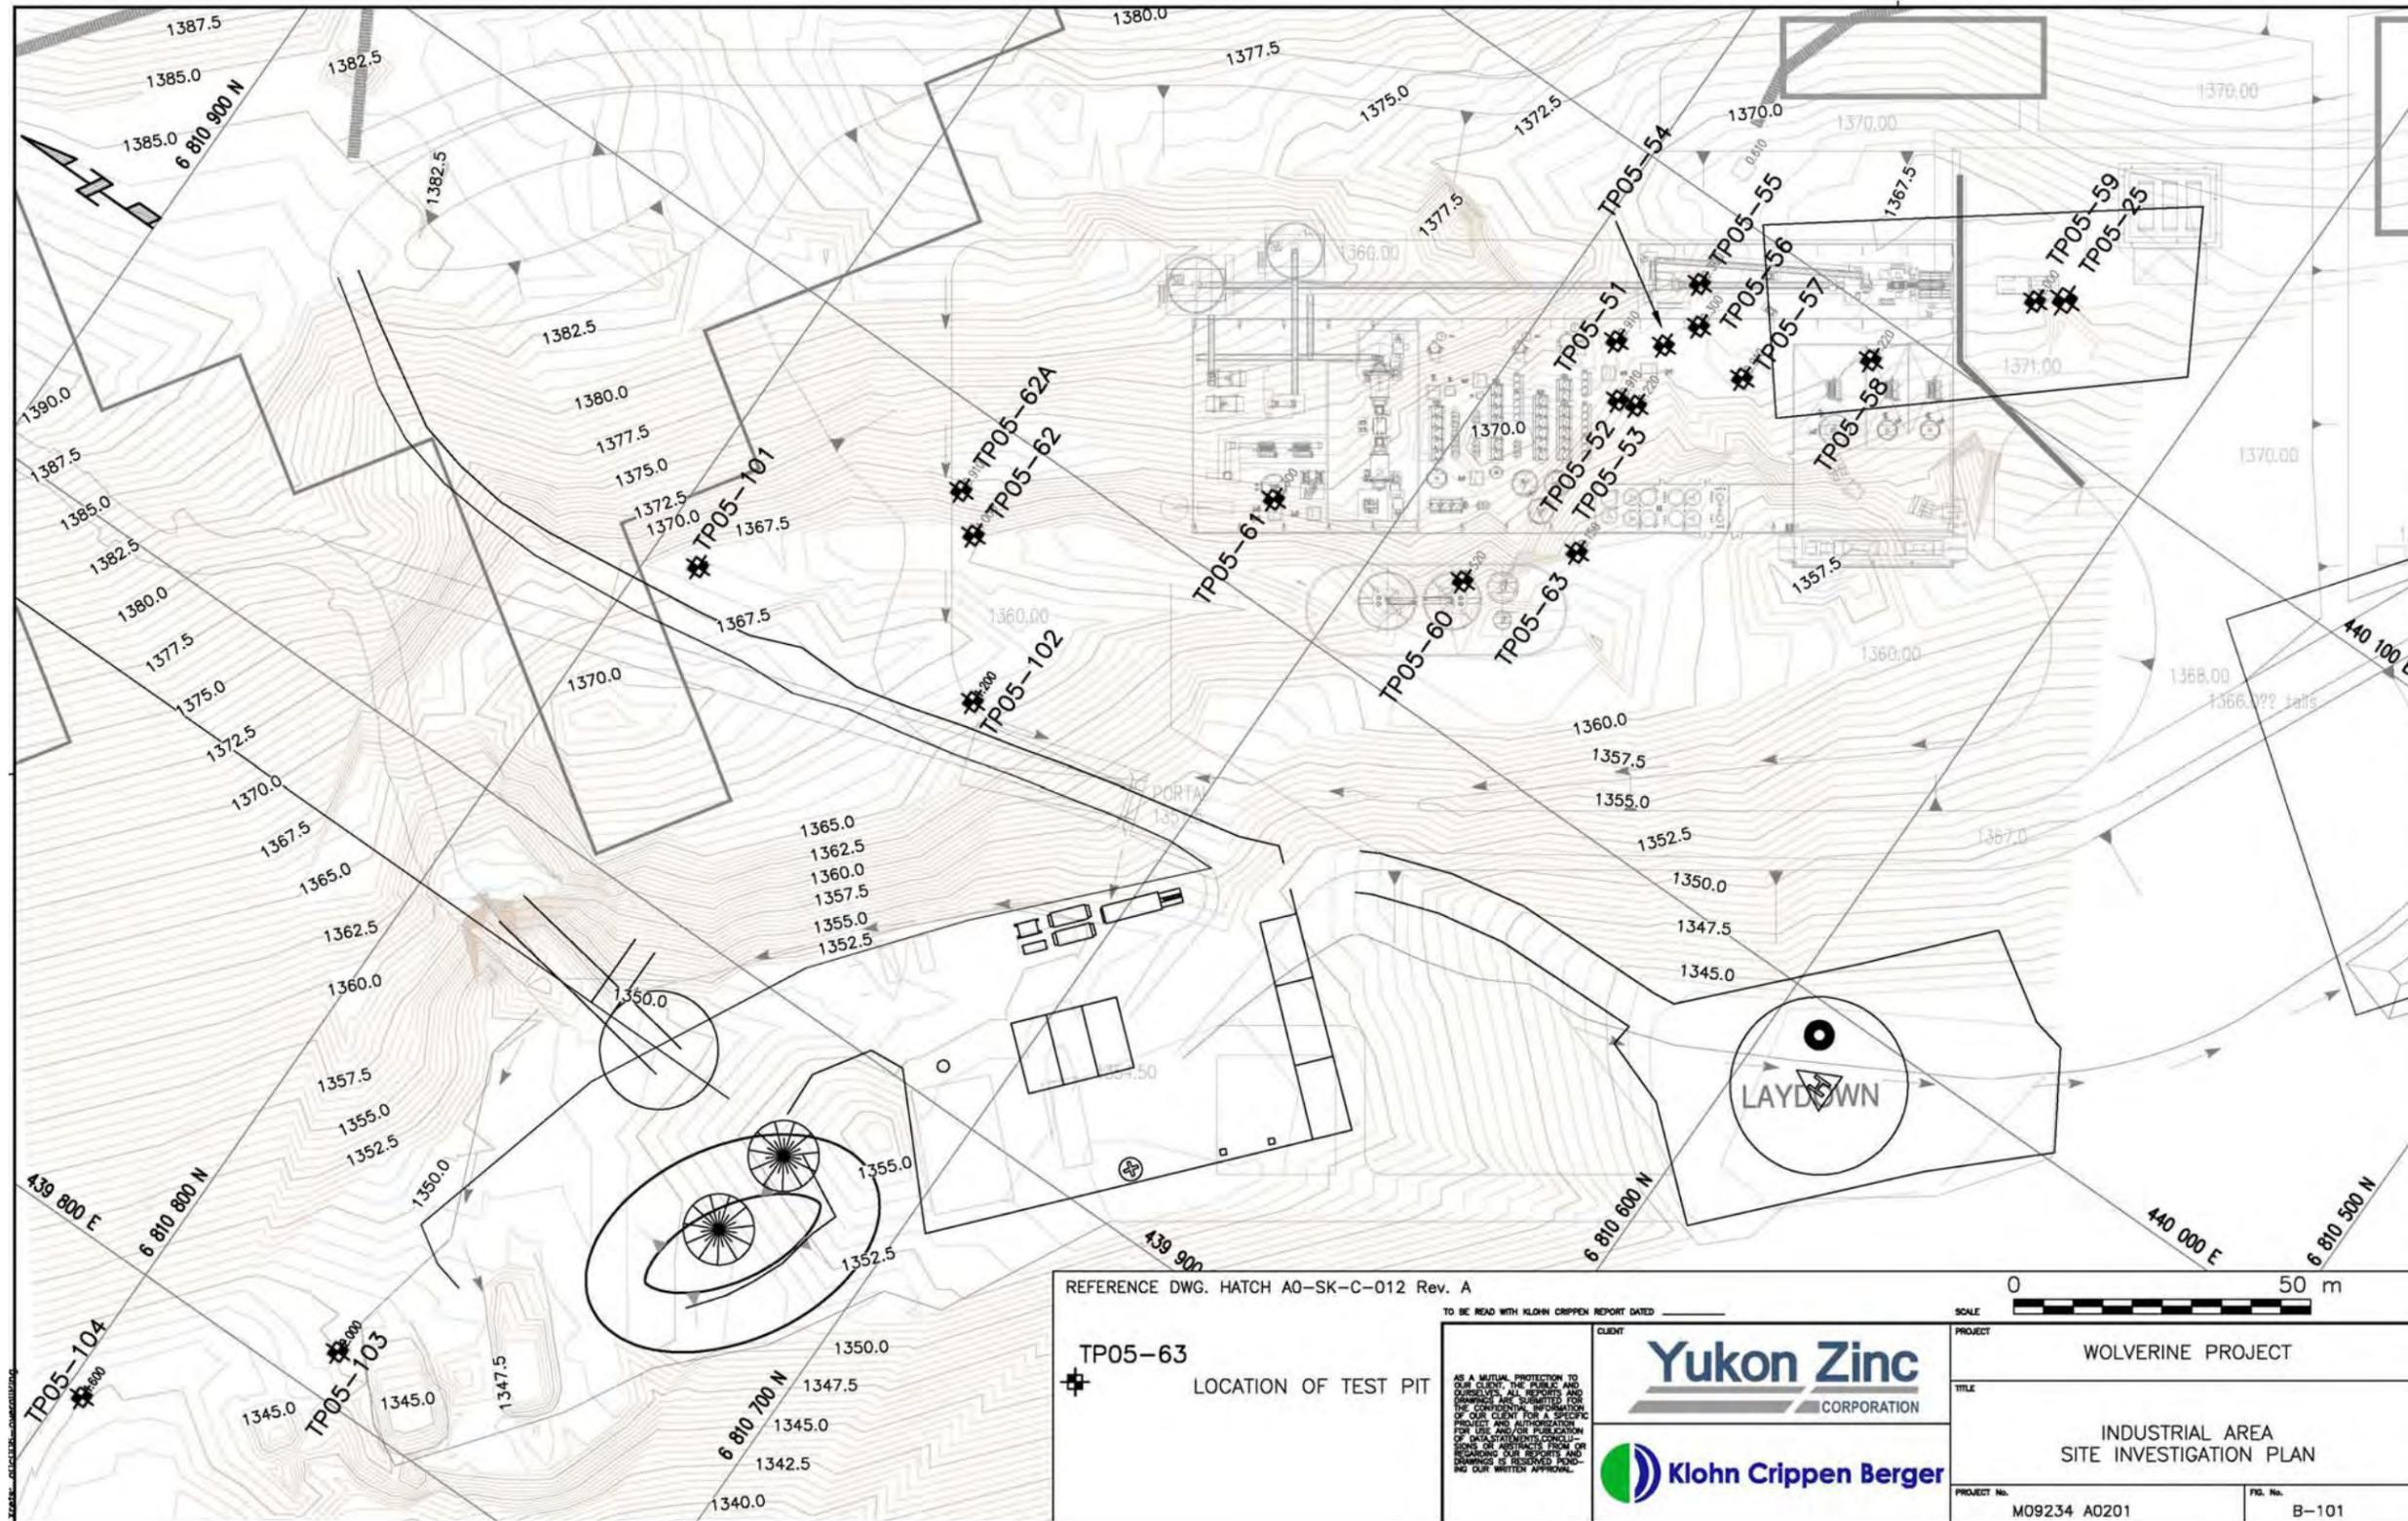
2005 Geotechnical Assessment Test Pit Locations
